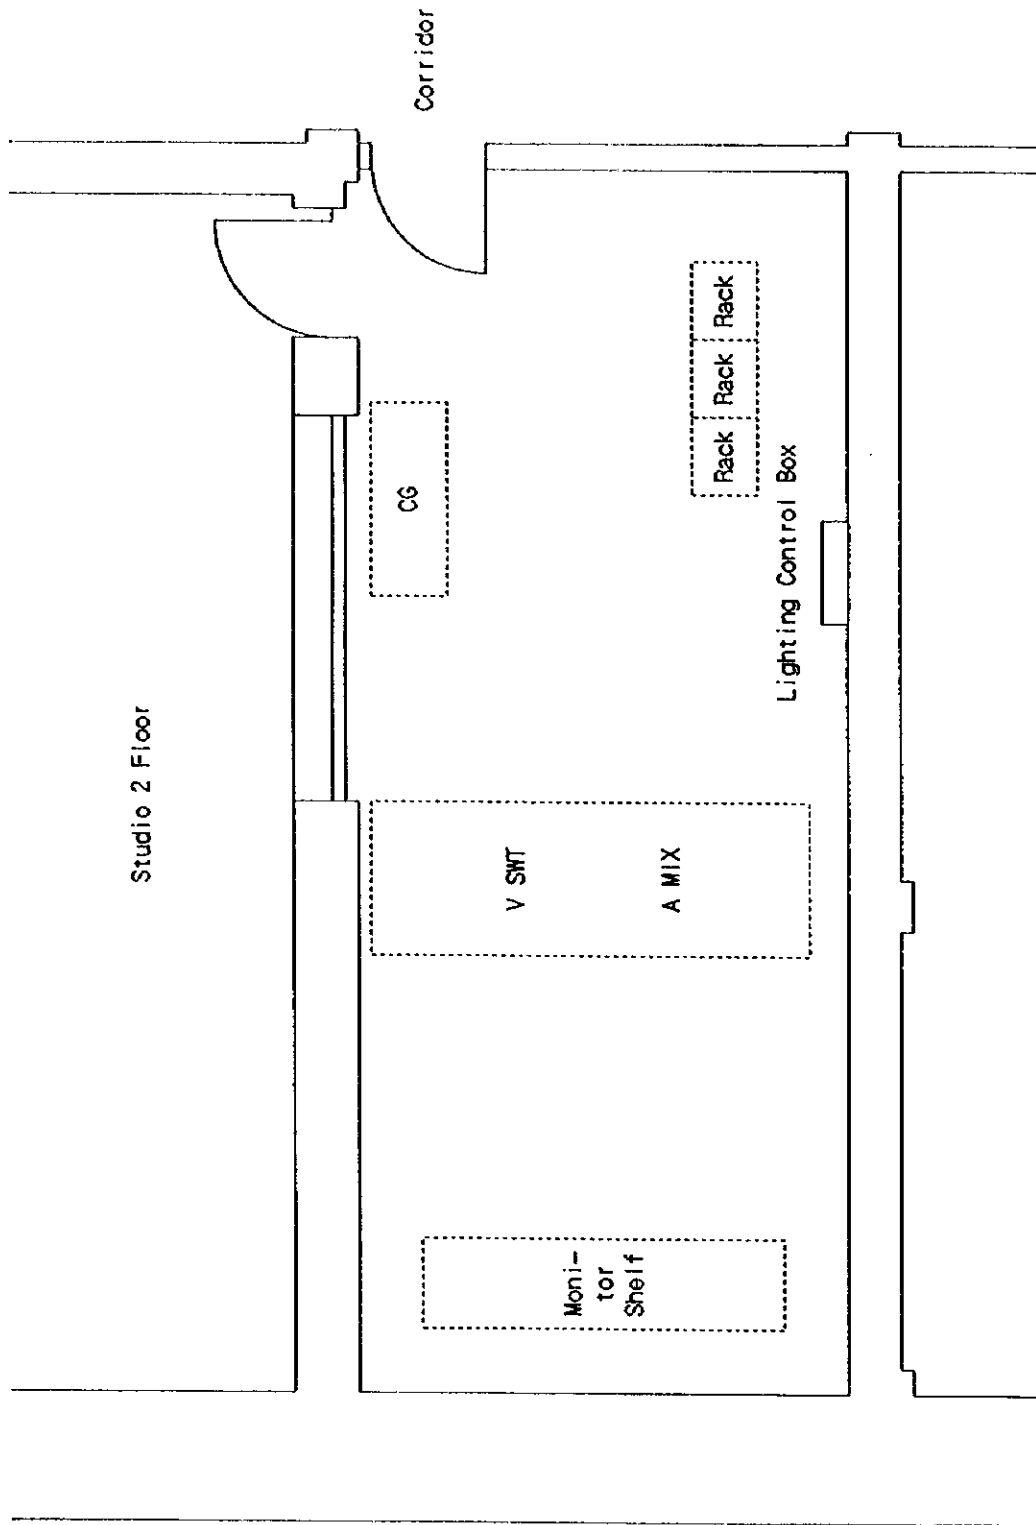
Equipment Layout of Studio 2 Sub-control Room
